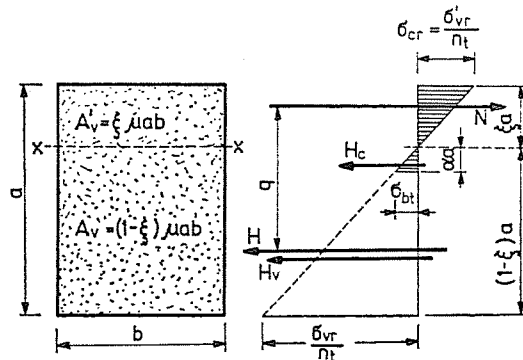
Calculation of the cracked concrete cross section with wire reinforcement
